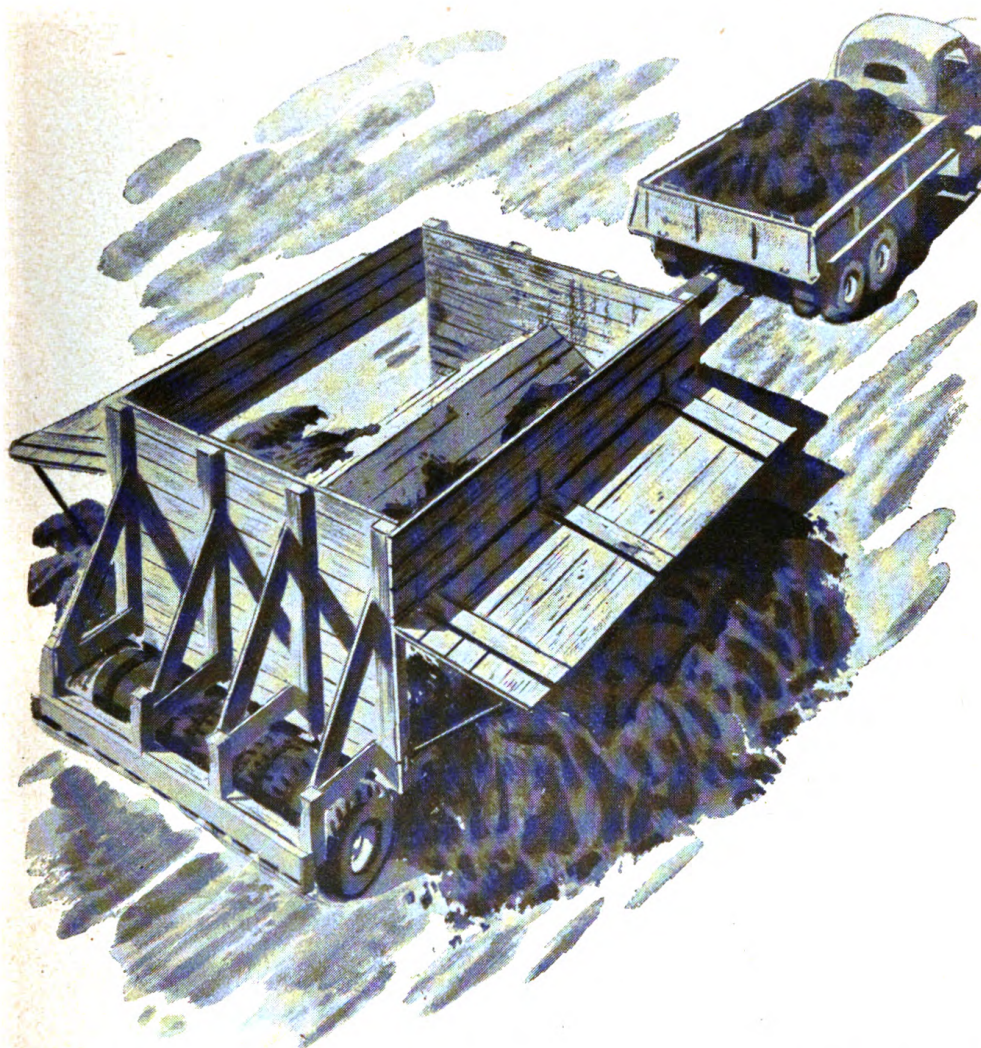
Improvised trailer-mounted box used to haul earth. Inverted V-bottom facilitates unloading.
